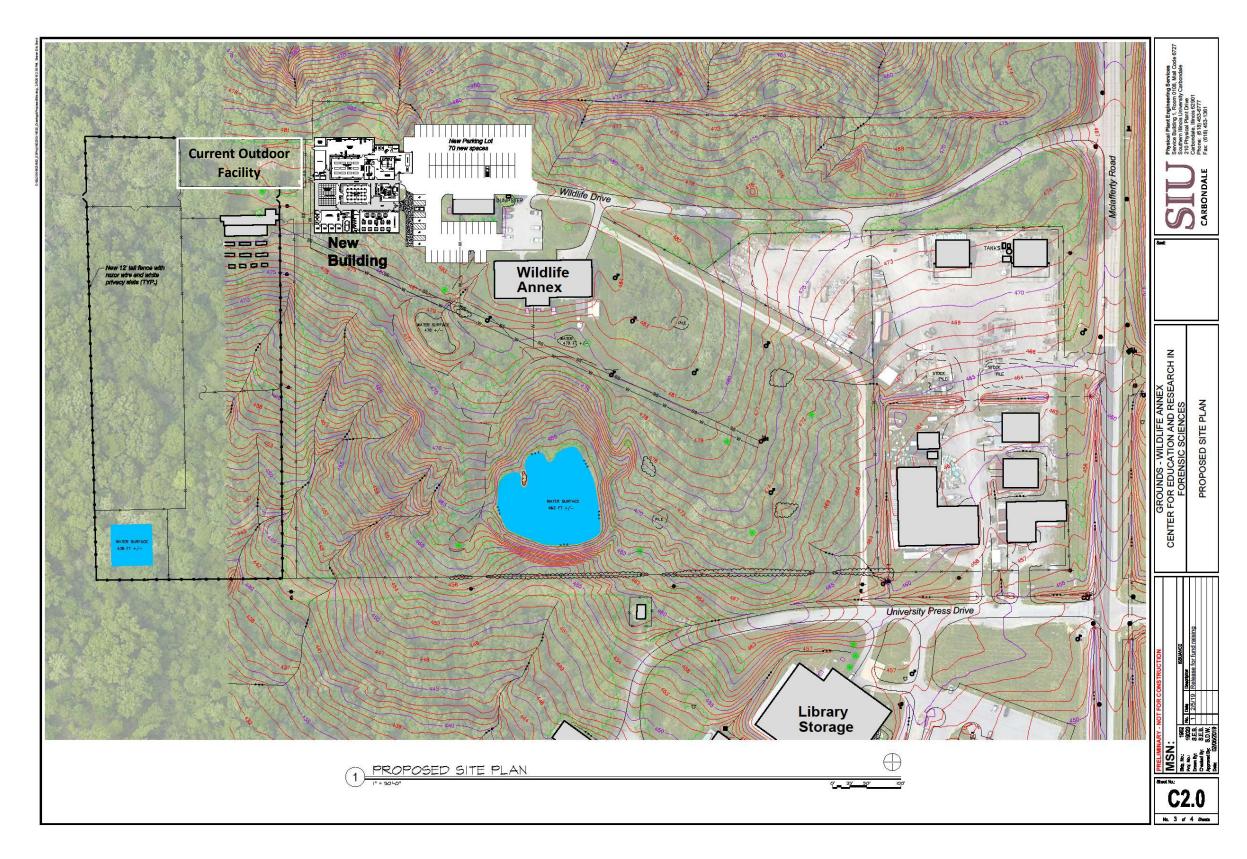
Current Site of CFAR and proposed outdoor expansion with new construction
